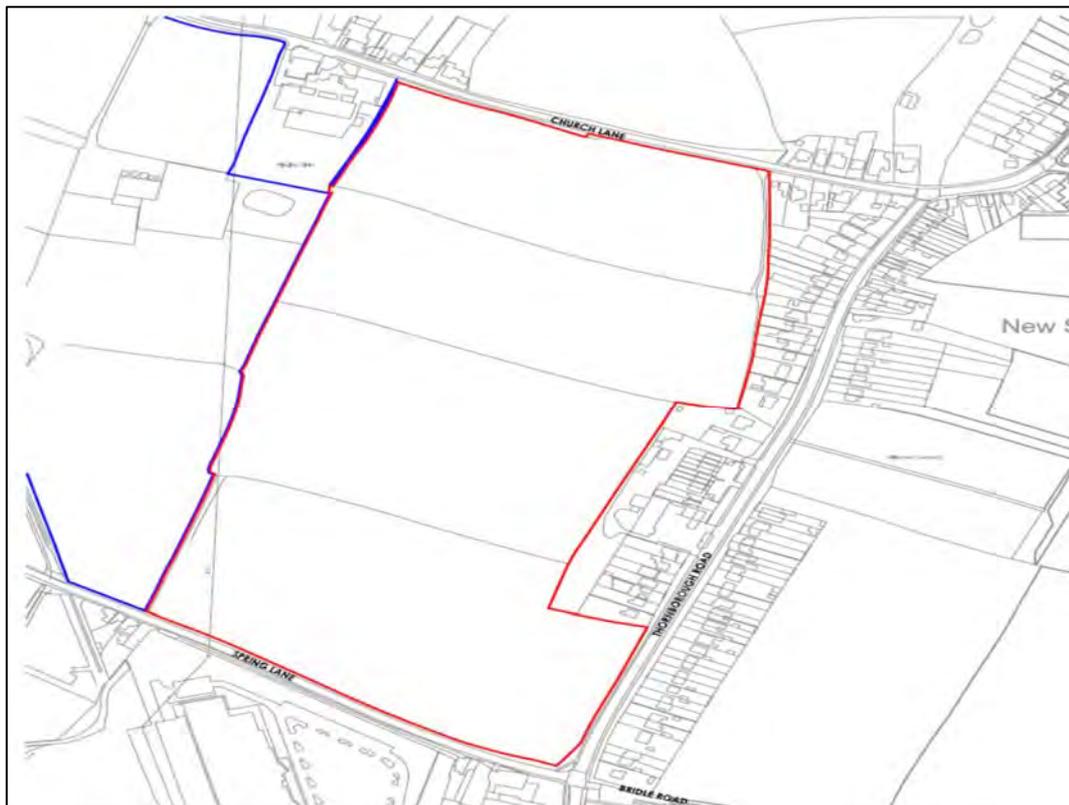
Site location plan: Land south of Church Lane, Coalville
